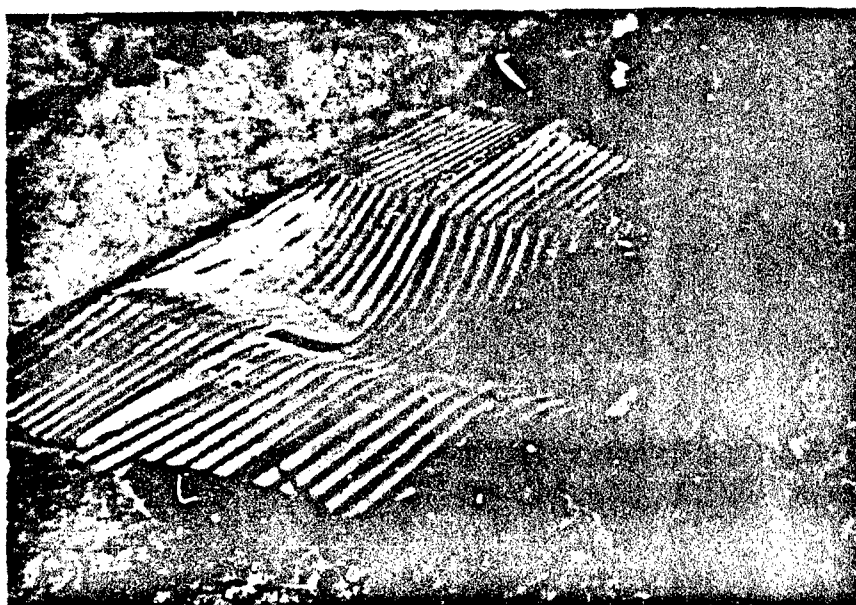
Posttest Photograph of Corrugated Steel Closure.
